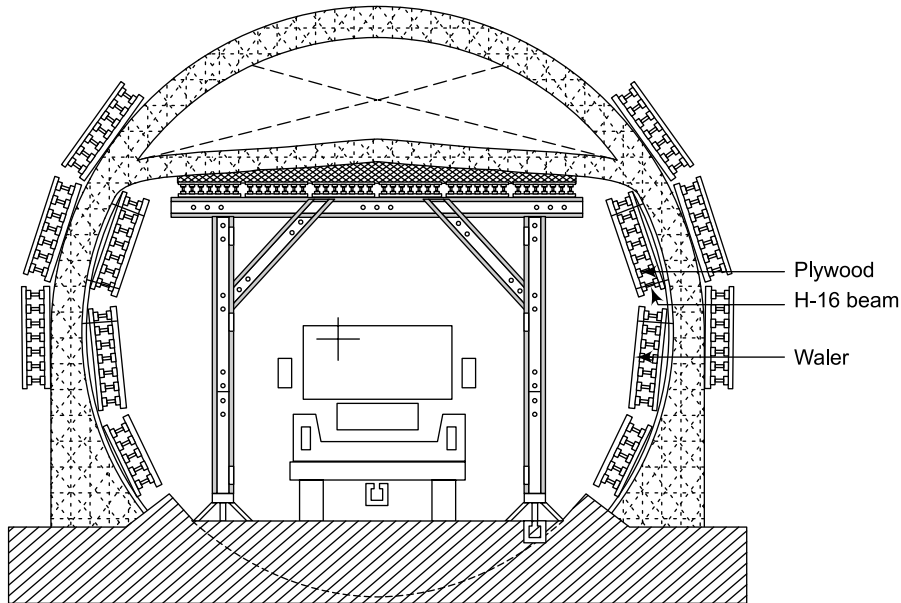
Formwork Arrangement for Tunnel Construction (Courtesy Doka).
